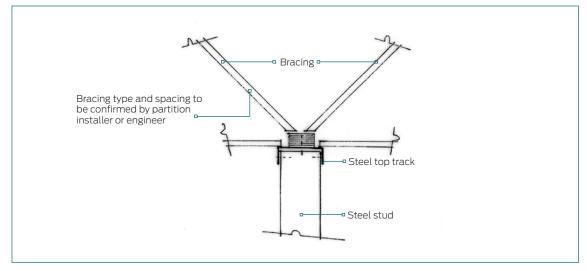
Generic internal wall bracing connection - wall terminates at ceiling.
